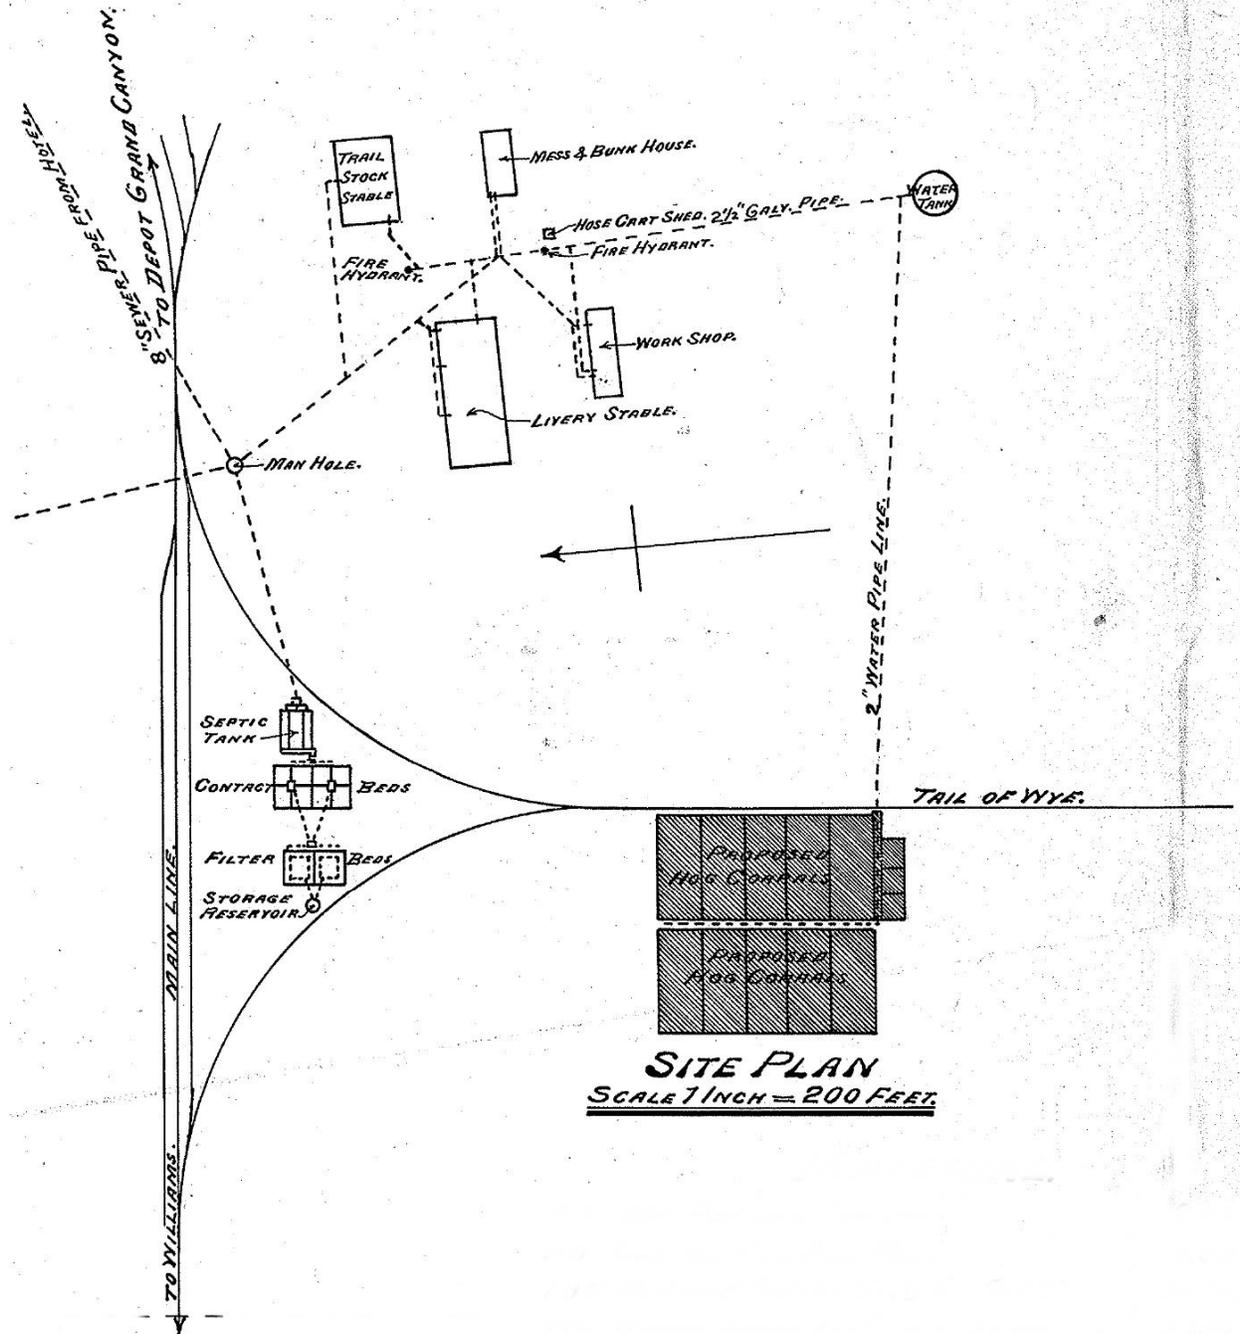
Site Plan, Drawing No. 113-8021, 1908, GRCA 67622.
